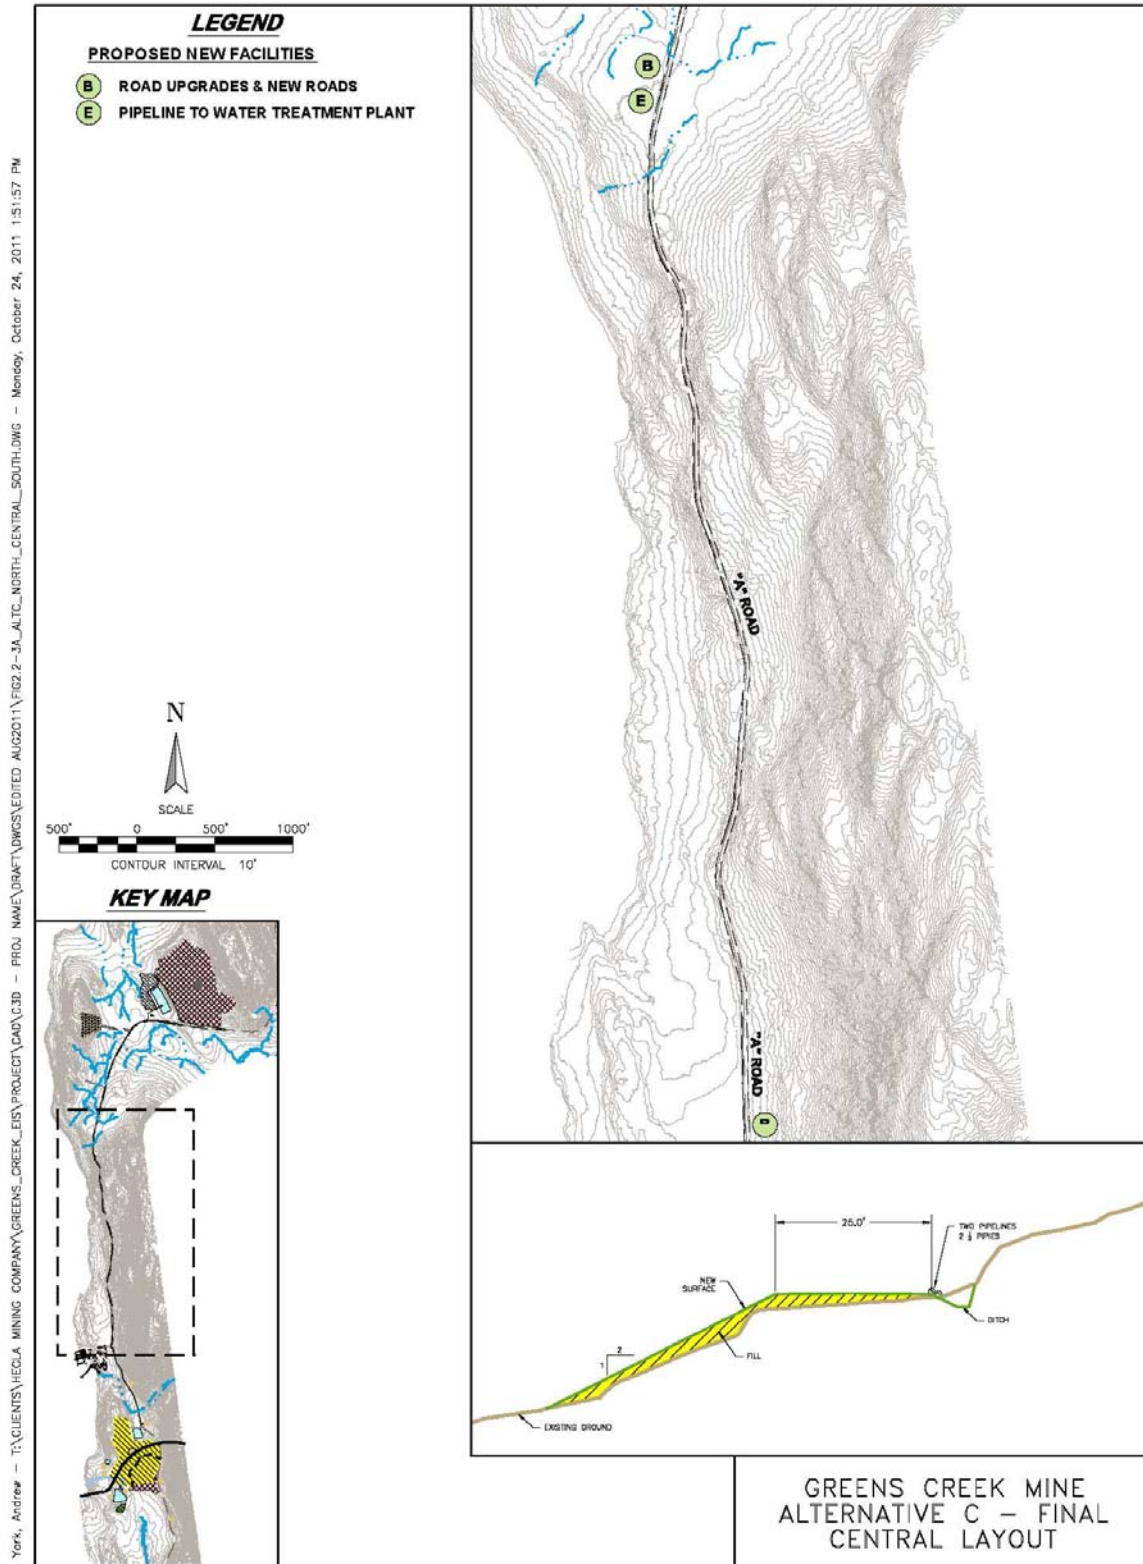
Greens Creek Mine Alternative C – Final Central Layout.
